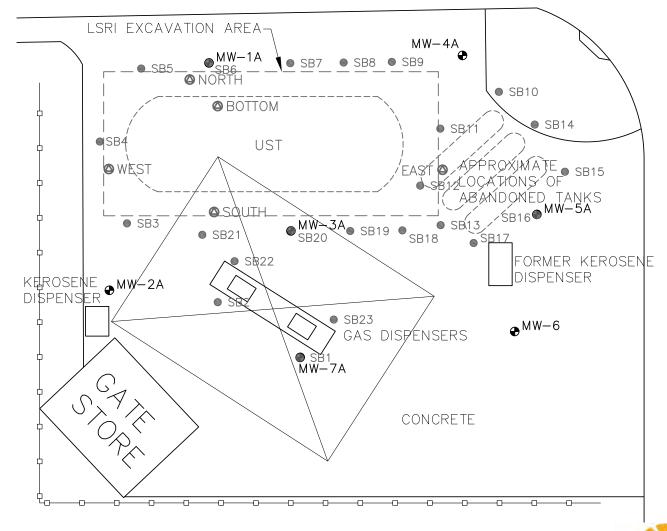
SITE LAYOUT GATE #1107 3020 N. LIBERTY STREET, JACKSONVILLE, FLORIDA
